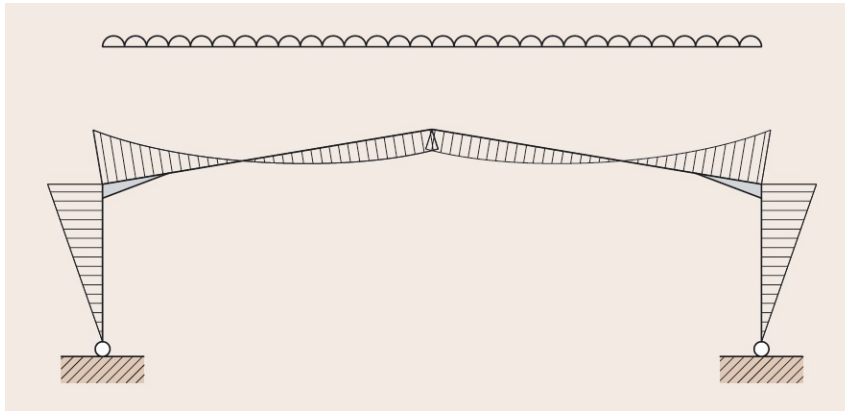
Typical Bending moment under symmetrical vertical loading arrangement [7]
